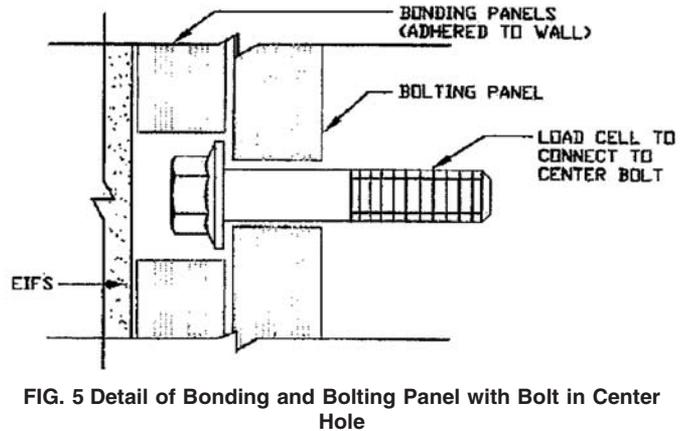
Detail of Bonding and Bolting Panel with Bolt in Center Hole
